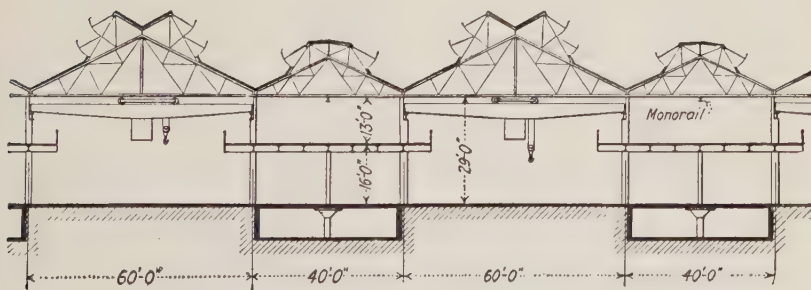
Cross-Section of Manufacturing Building, Showing Bay and Balconies. Combination type building (part of the plant of which the general plan of the entire plant is shown in Figure 11)
